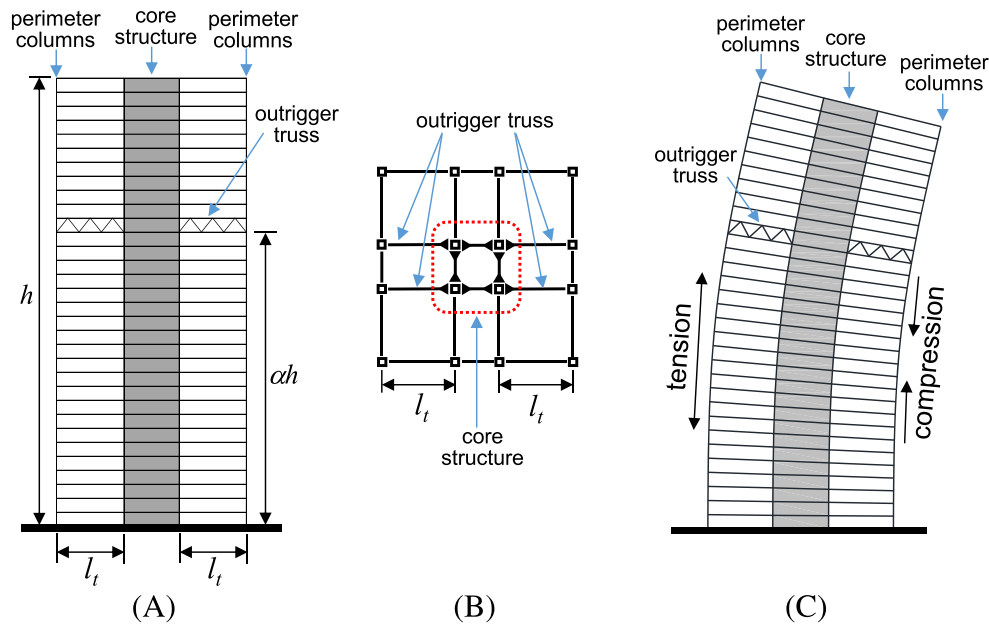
A, Elevation, B, floor framing plan on outrigger floor, and C, outrigger truss mobilizing perimeter column axial stiffness [Colour figure can be viewed at wileyonlinelibrary.com]
